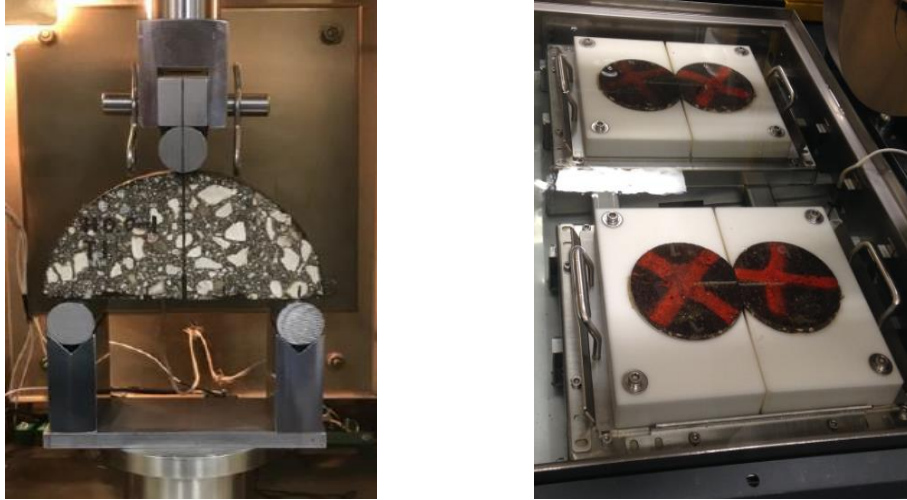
I-FIT (left) and HWTT (right) specimen before testing
